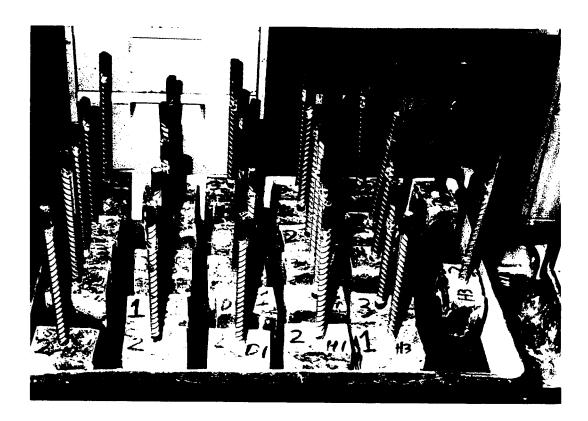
Reinforced Concrete Specimens Placed in the Chloride Solution
